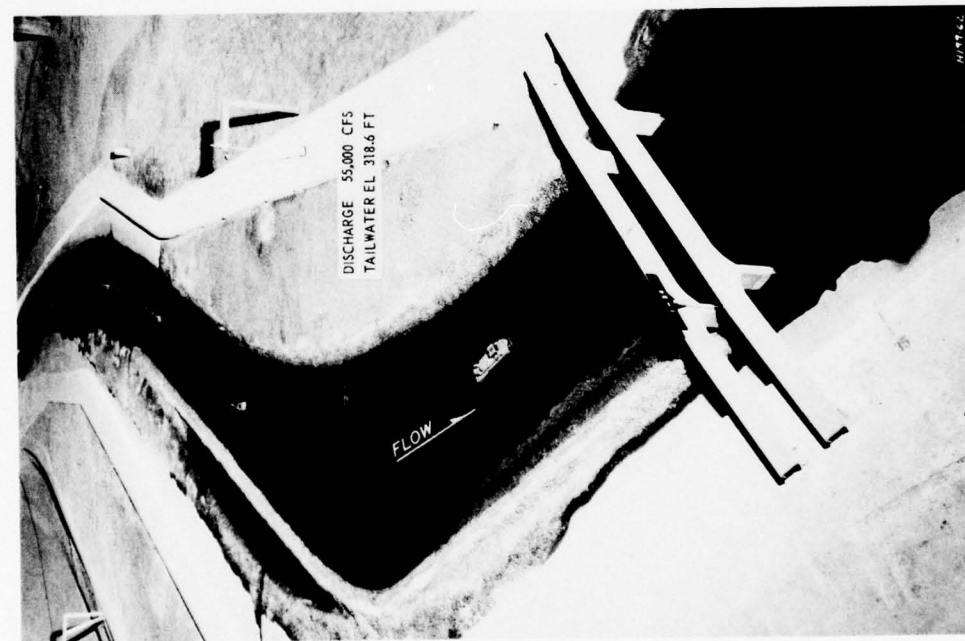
Plan C; path of downbound tow navigating bend at mile 28.1 and through the Hwy I-24 Bridge
